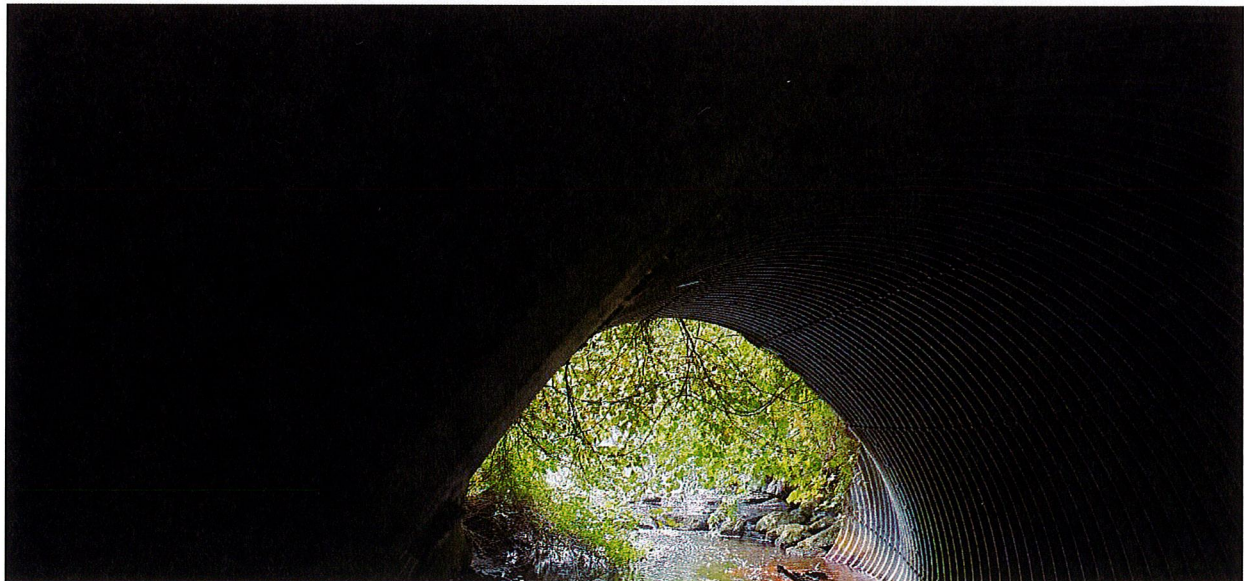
Flat area of culvert beneath Southbound lane. Photo taken facing East.
